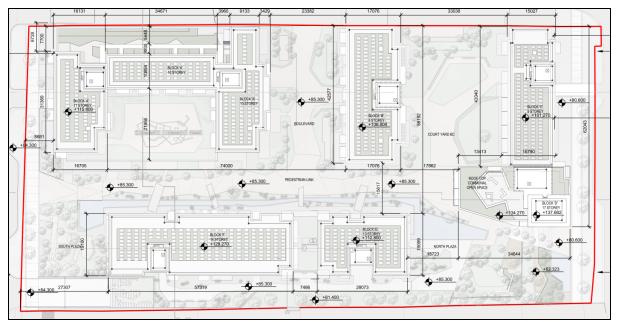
Proposed Site Plan (Source: HJL Drawing No. SFC-HJL-ST-00-DR-A-1000)
